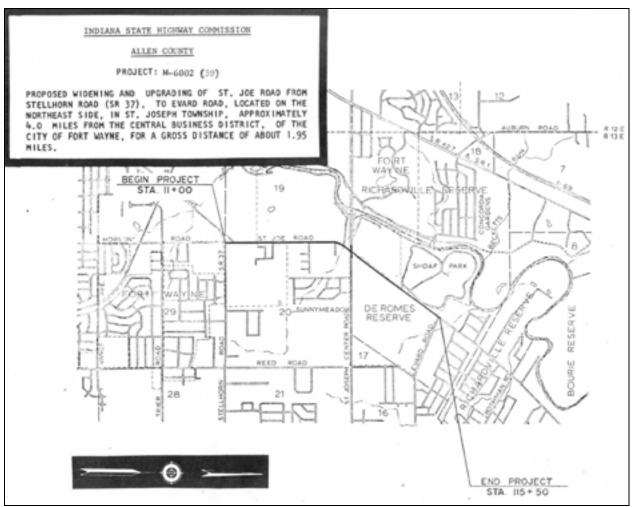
In 1974, the City of Fort Wayne undertook an improvement project for St. Joe Road. A major element of the project was the widening of a portion of the road from Stellhorn Road to Evard Road, across from Shoaff Park. Additional improvements included the construction of bike paths and sidewalks, which the City hoped would bring visitors to the park. (R- FWP-SHO-PD-StJoe-Rd-Widen-06-18-1974.jpg) Courtesy Fort Wayne Parks and Recreation.
